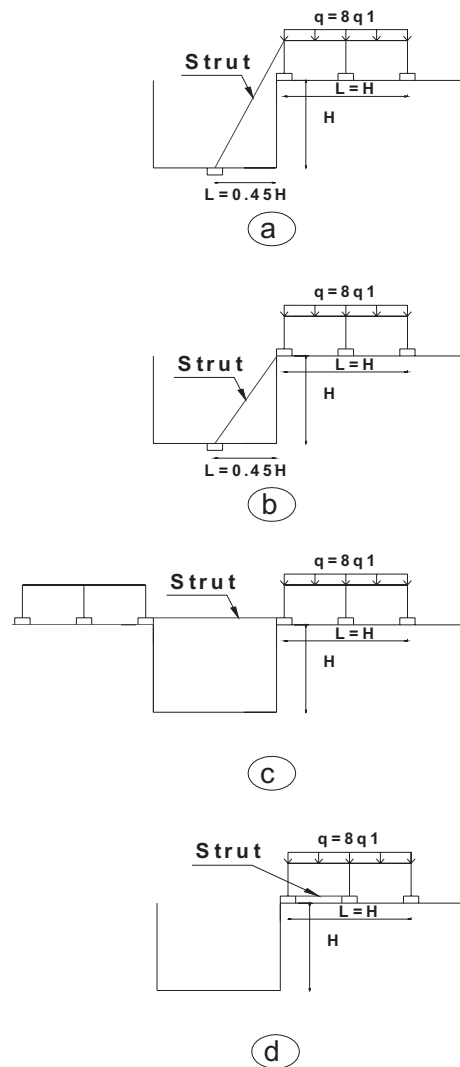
Common configurations of excavation procedure used in traditional shoring method which are investigated in previous studies. (a) Inclined struts connected to the first floor. (b) Inclined struts connected to the footing. (c) flying shoring. (d) Two adjacent footing of neighbouring building are fully connected. (Sadeghian & Fakher, 2010).
